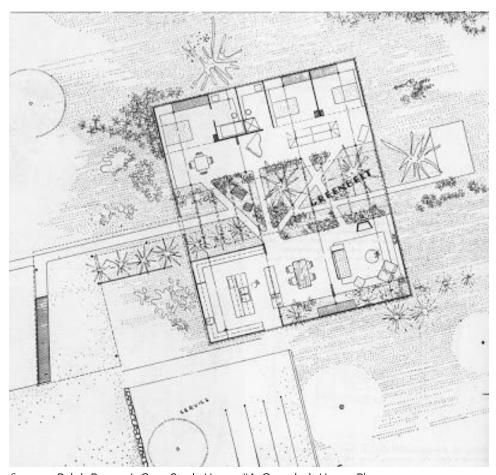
Ralph Rapson's Case Study House #4, Greenbelt House Plan
